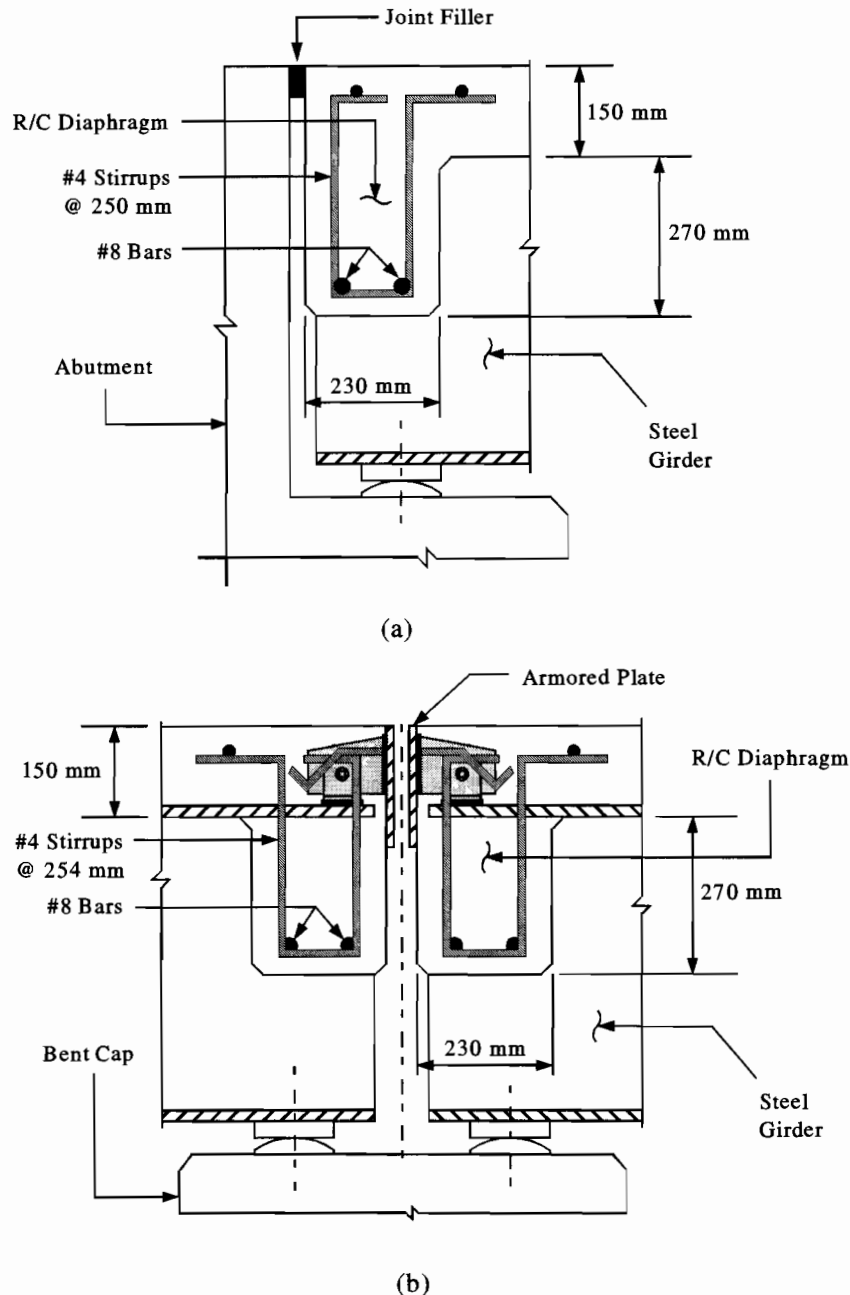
Expansion Joint Detail (a) At Abutment and (b) Between Units.
